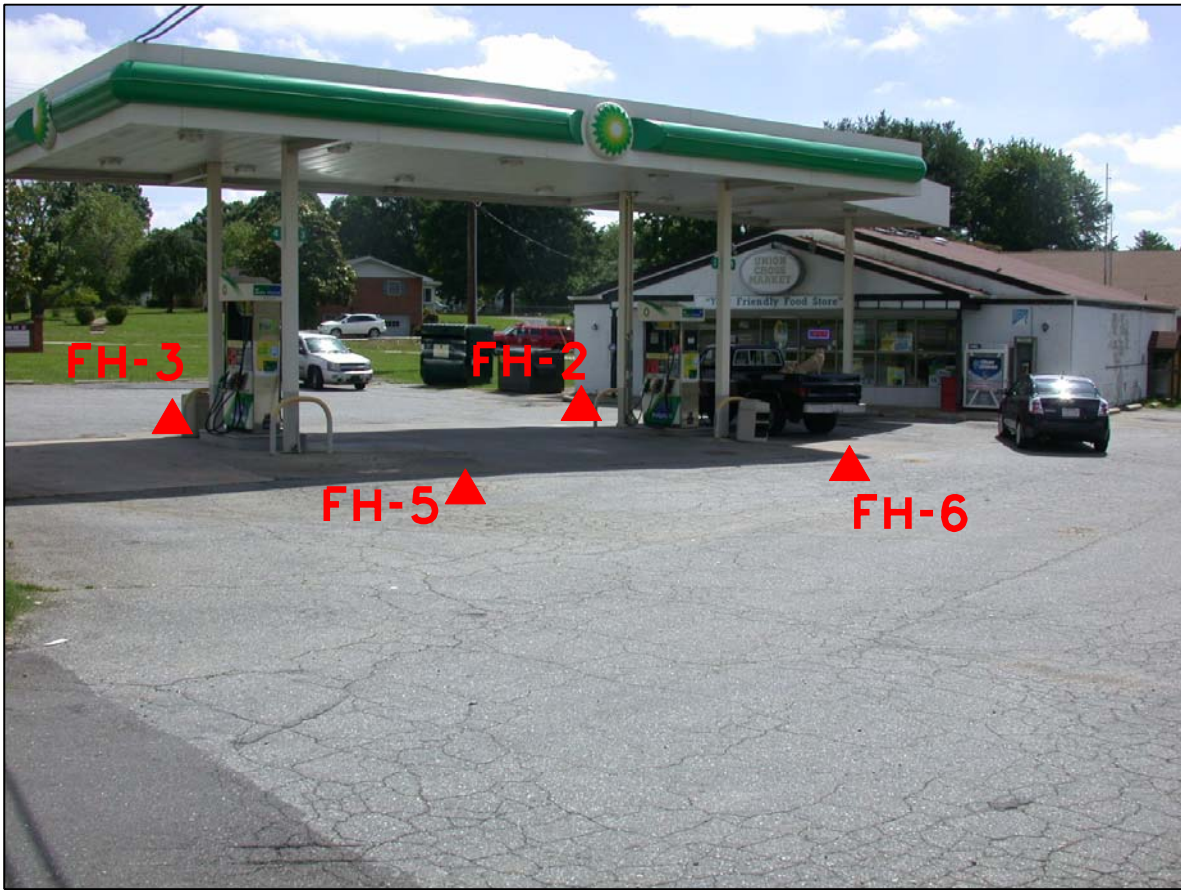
BORINGS WITHIN PROPOSED R/W LOOKING NORTHEAST
